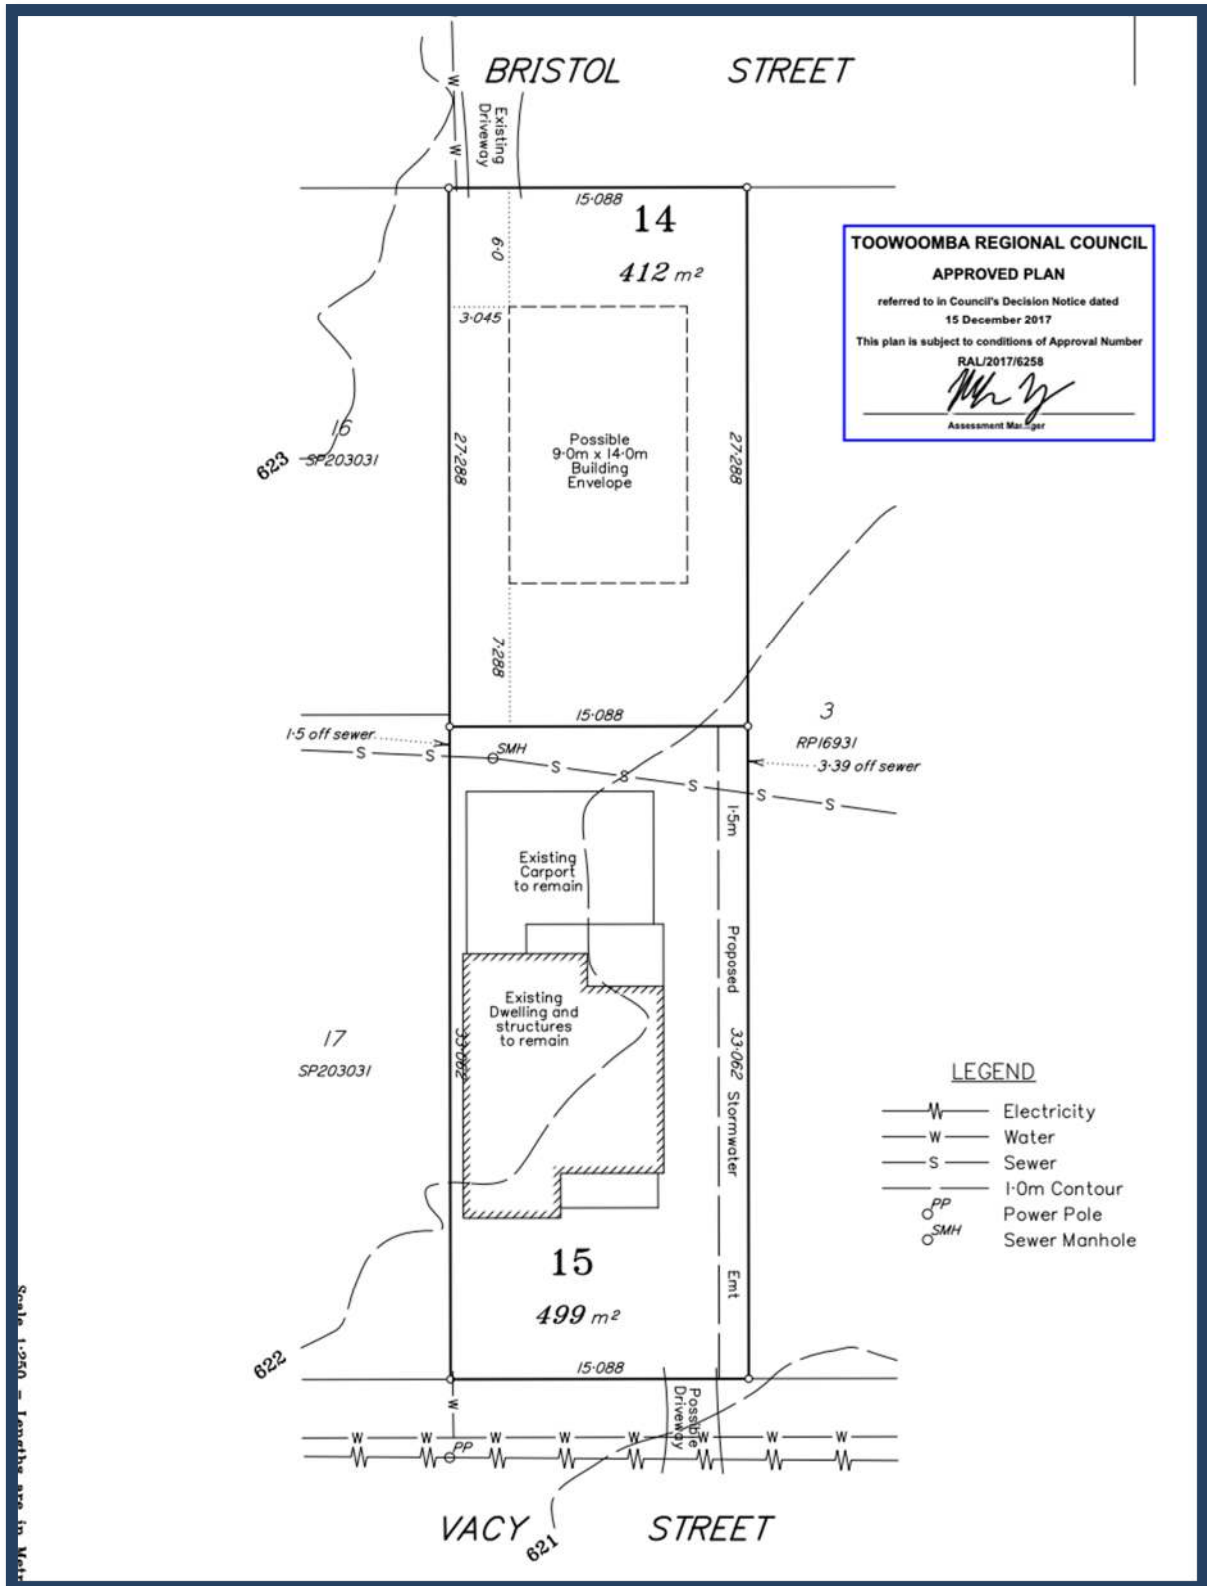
Approved plan of former proposed RAL (lapsed) (Source: Development.i – TRC)
